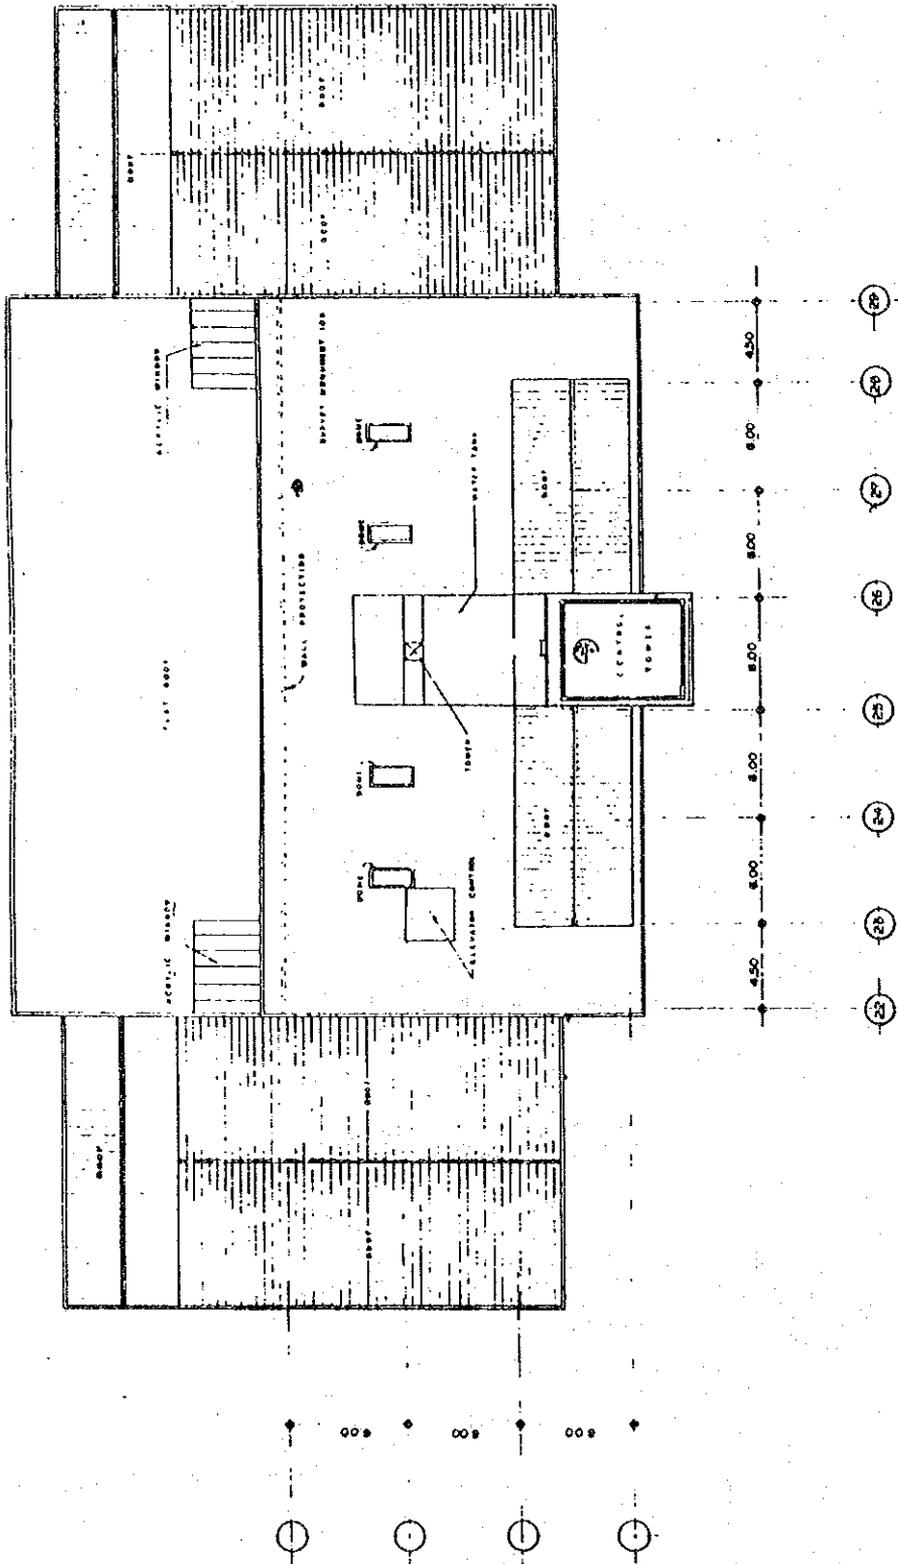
Existing Floor Plan of International Passenger Terminal Building (Fourth Floor)
